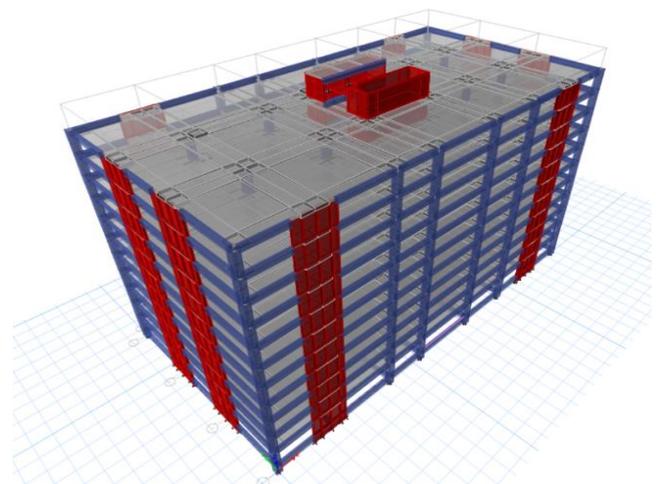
Flat slab with shear wall at corners having (G+10) story building (3D View)
